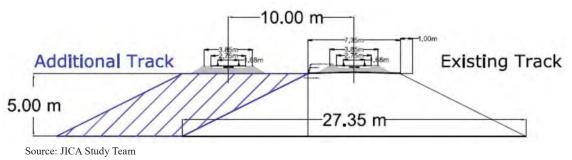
Typical Cross Section of Embankment at Spur Line
